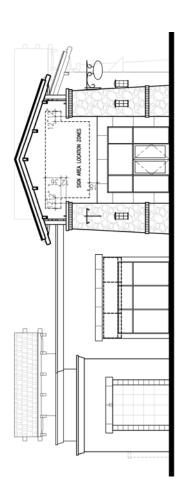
Front Elevation Typical Main Street Shop and Multi-Tenant Pads
